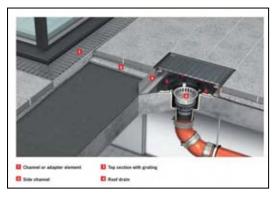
Typical Terrace drainage collection systems Source: ACO Drain
